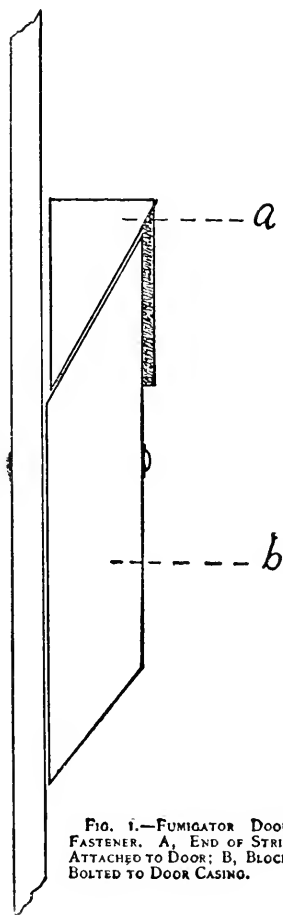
FUMIGATOR DOOR FASTENER. A, END OF STRIP ATTACHED TO DOOR; B, BLOCK BOLTED TO DOOR CASING.
